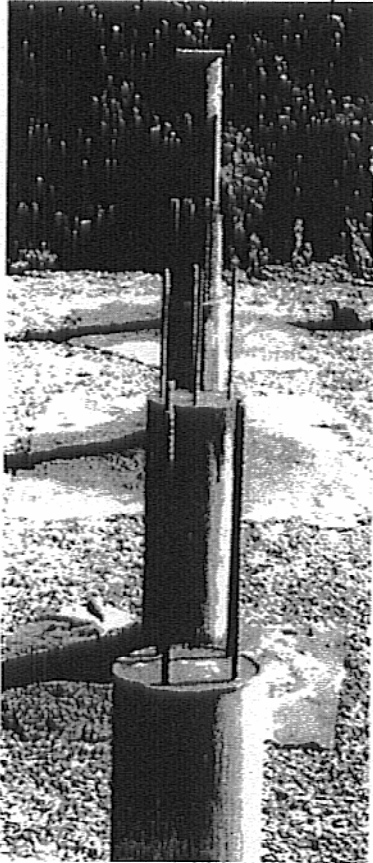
Minimal deviations of drilled piles in Tunnelipuisto underpass.
